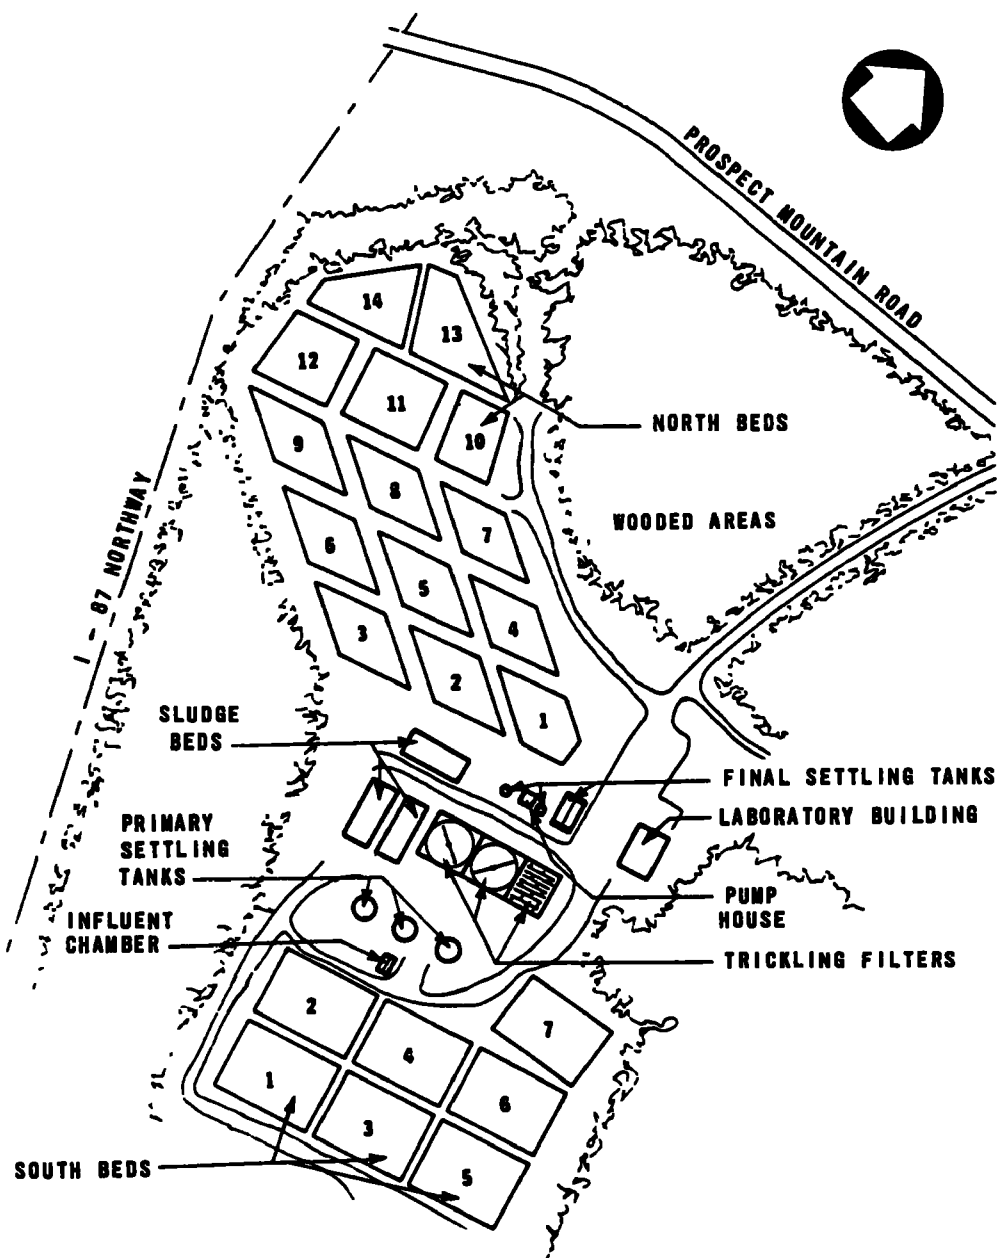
Plan of the Lake George Village wastewater treatment plant.
